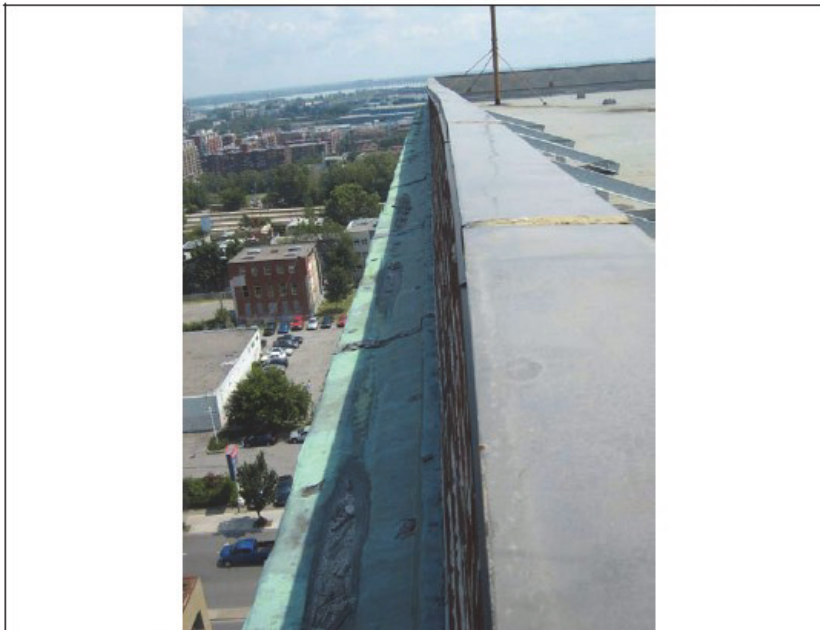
Bulging of the brick parapet wall with loose bricks and deteriorated mortar joints located on the south-eastern section of the roof.
